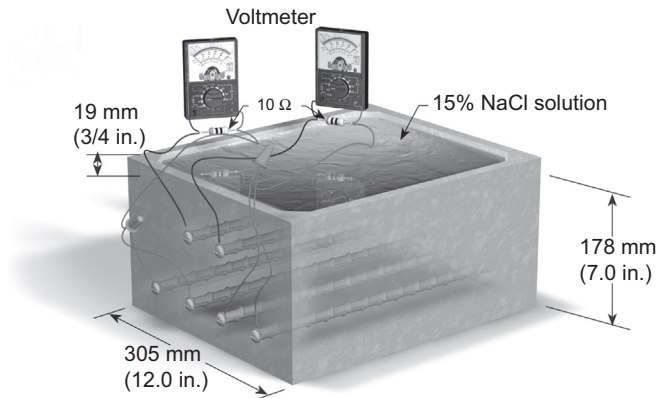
Southern exposure concrete specimens used to evaluate corrosion-resistant reinforcing bar systems.
